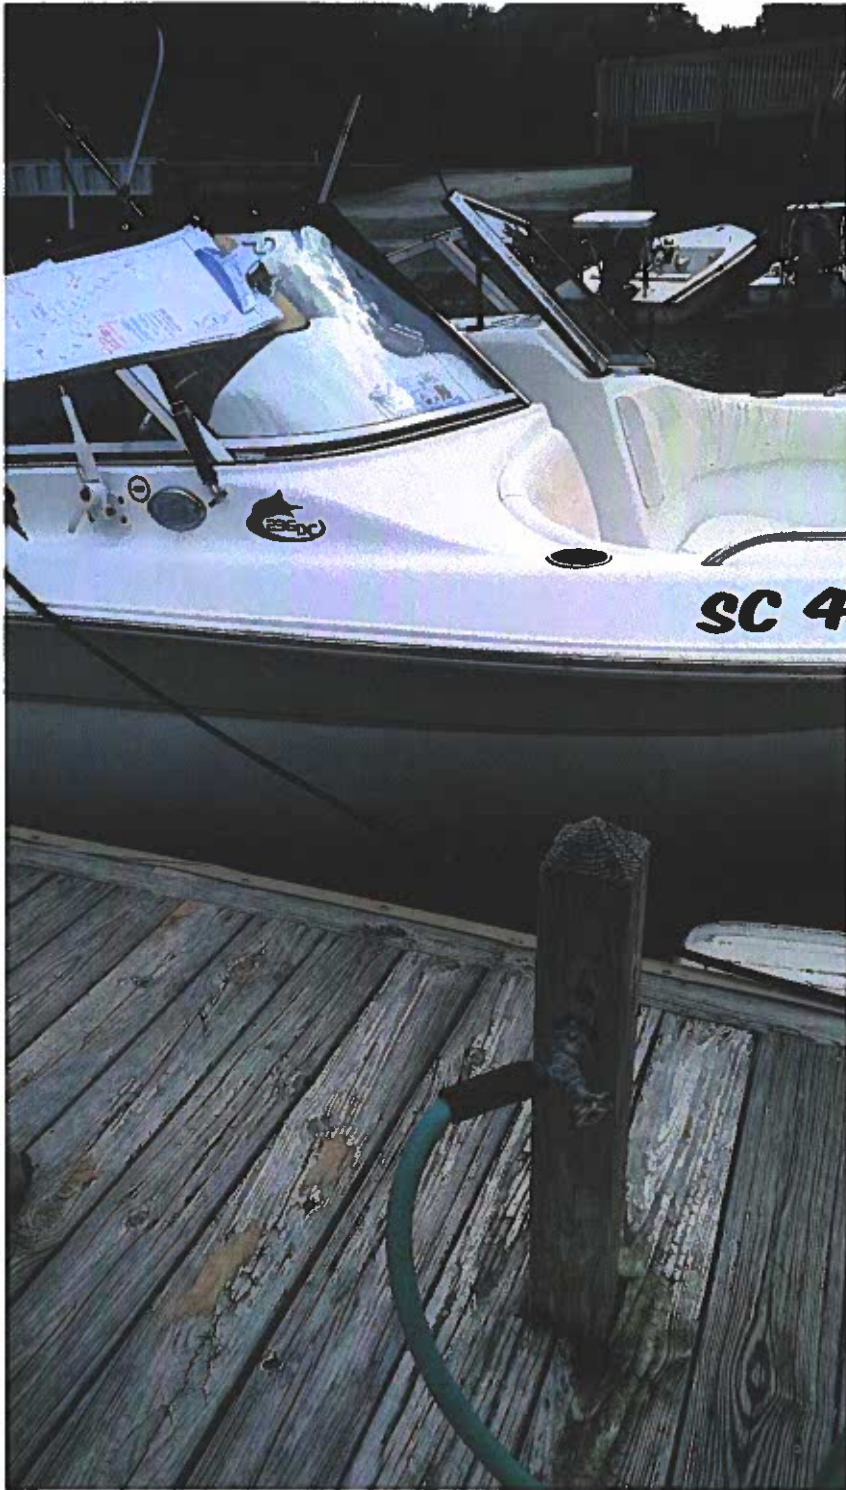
The piping not properly supported and is subject to U.V. degradation.
